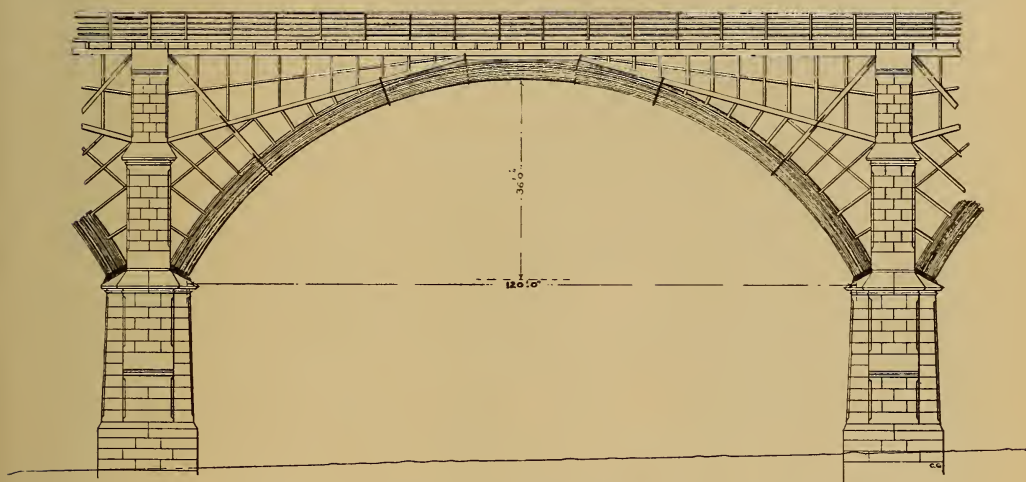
LAMINATED TIMBER ARCHES OVER WILLINGTON DEAN AND OUSEBURN DEAN, 1838.
